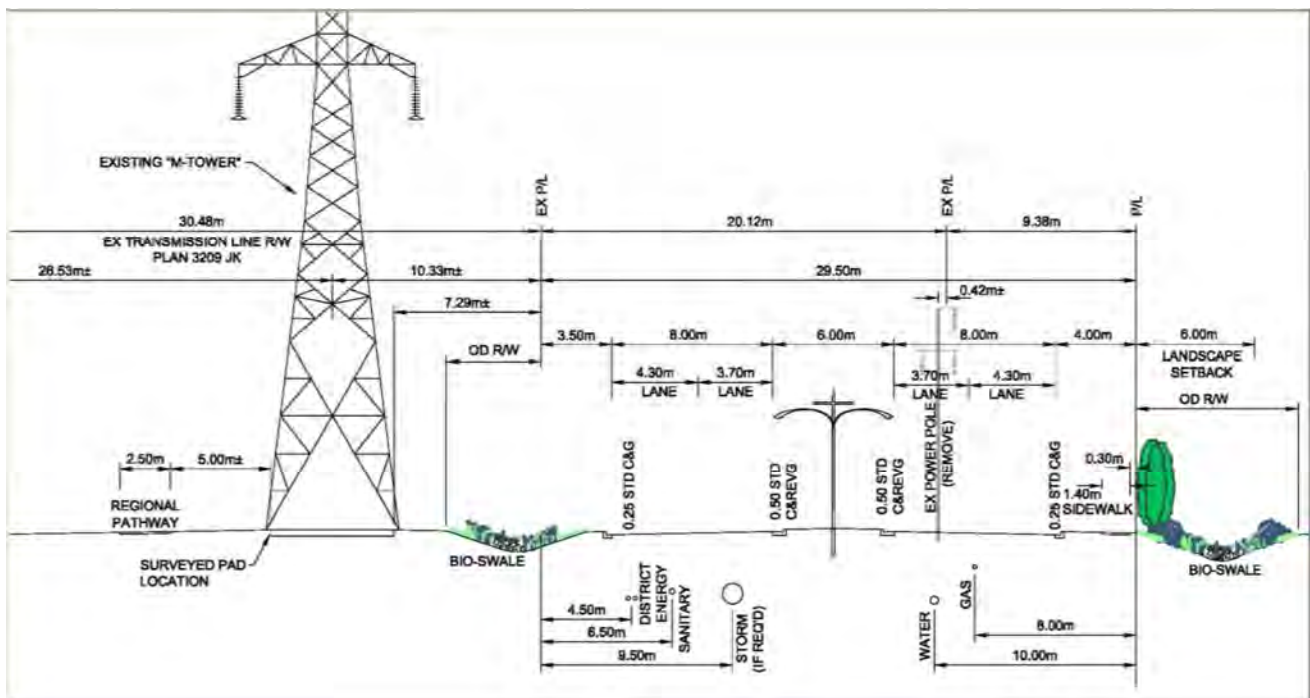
PROPOSED 100 ST SE CROSS-SECTION
